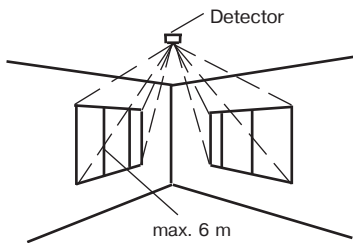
Installing the Detector on the Ceiling (for window openings in the neighboring walls monitoring)
